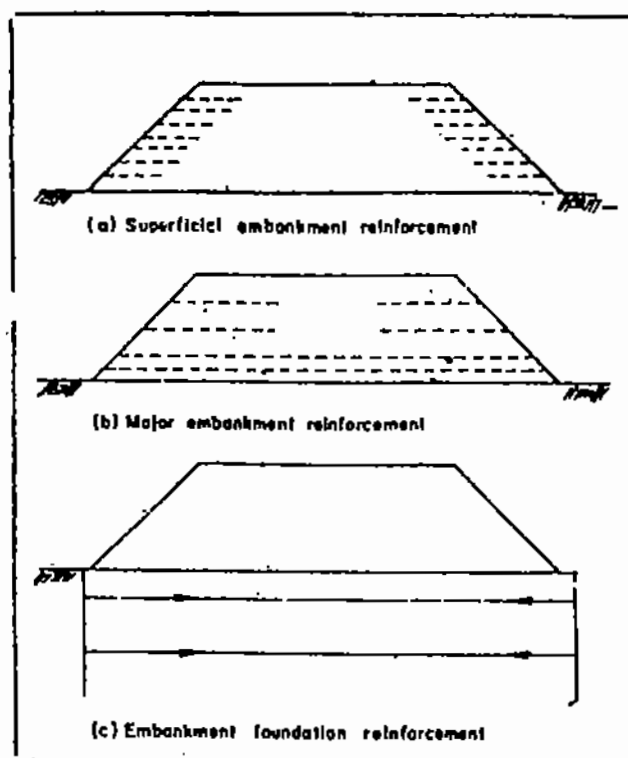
Modes of embankment reinforcing ^{39, 40}
